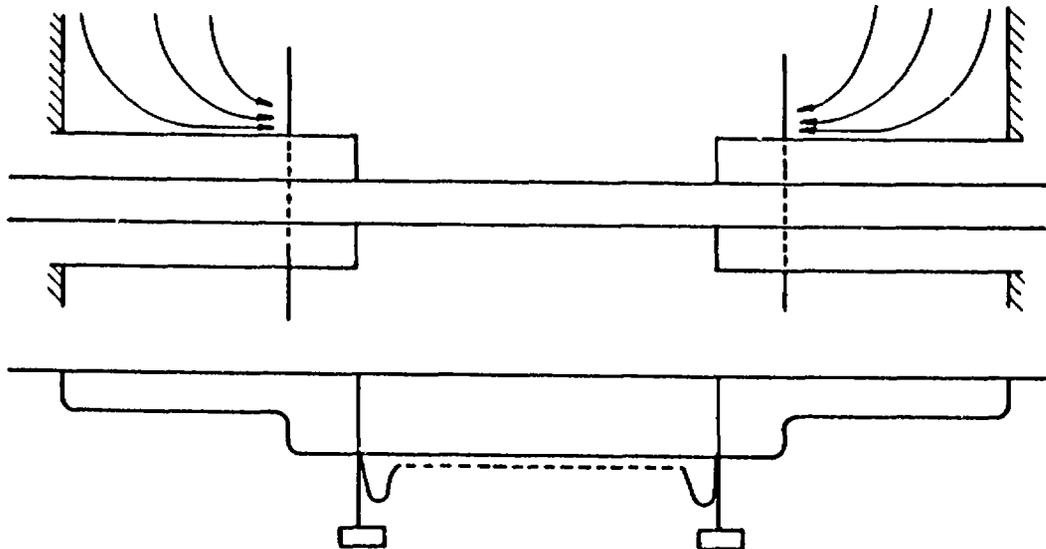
Bridge Abutment in Main Channel and Overbank Flow.
